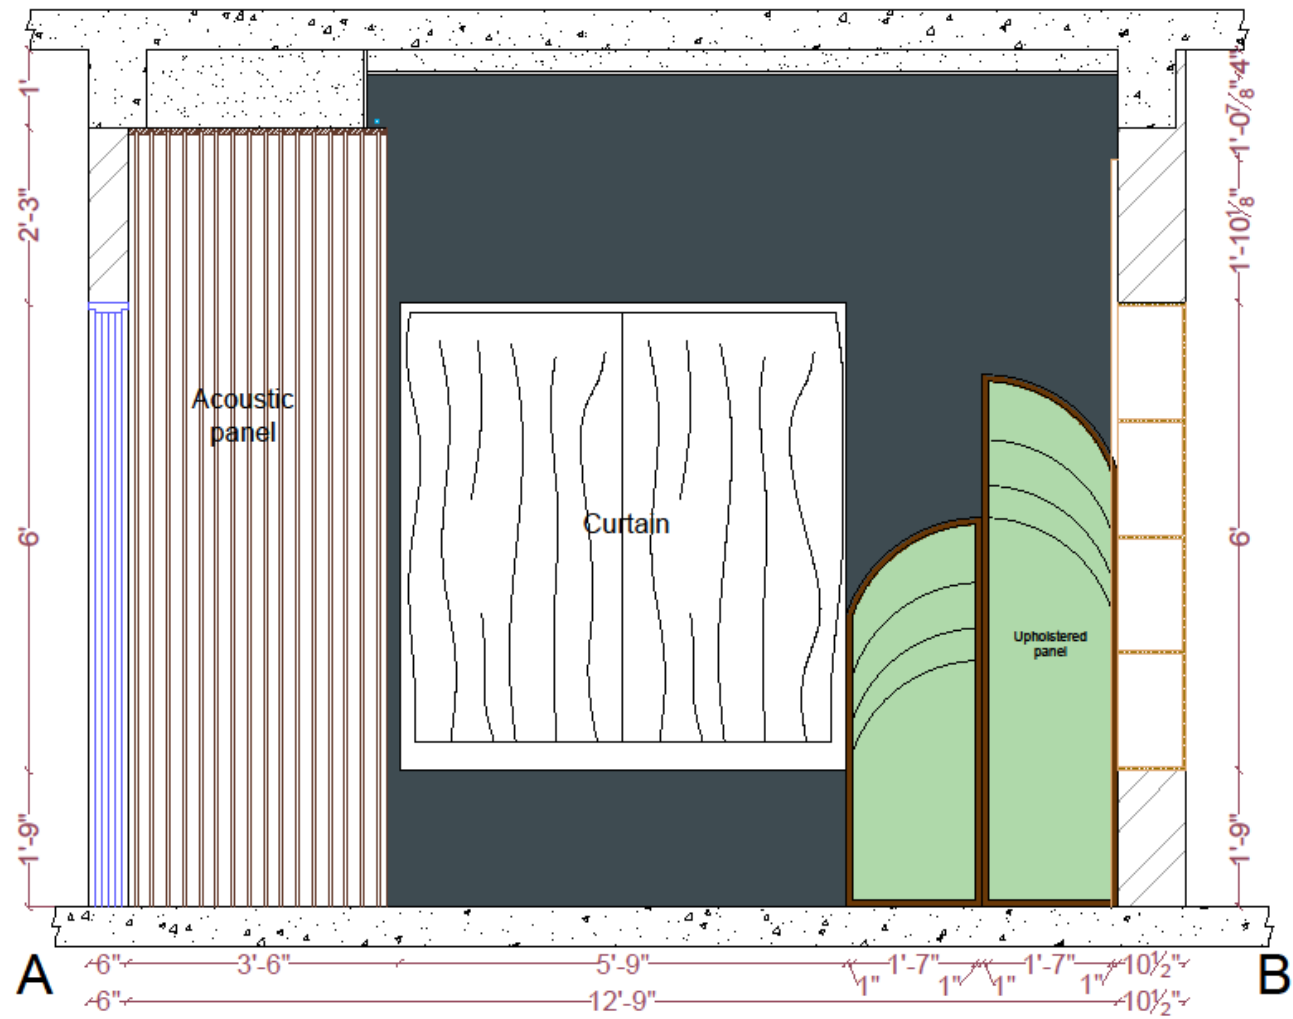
PROPOSED WALL ELEVATION AB (option -3)
